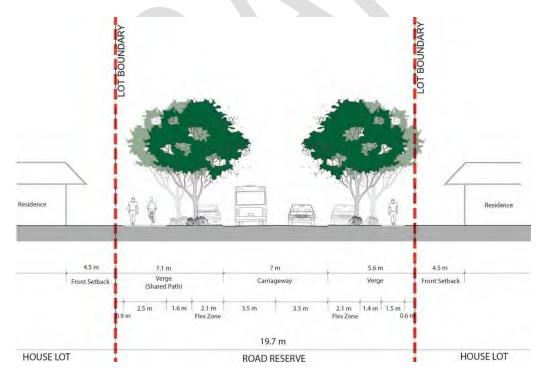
Collector Road Cross Section (Flex Zone)
